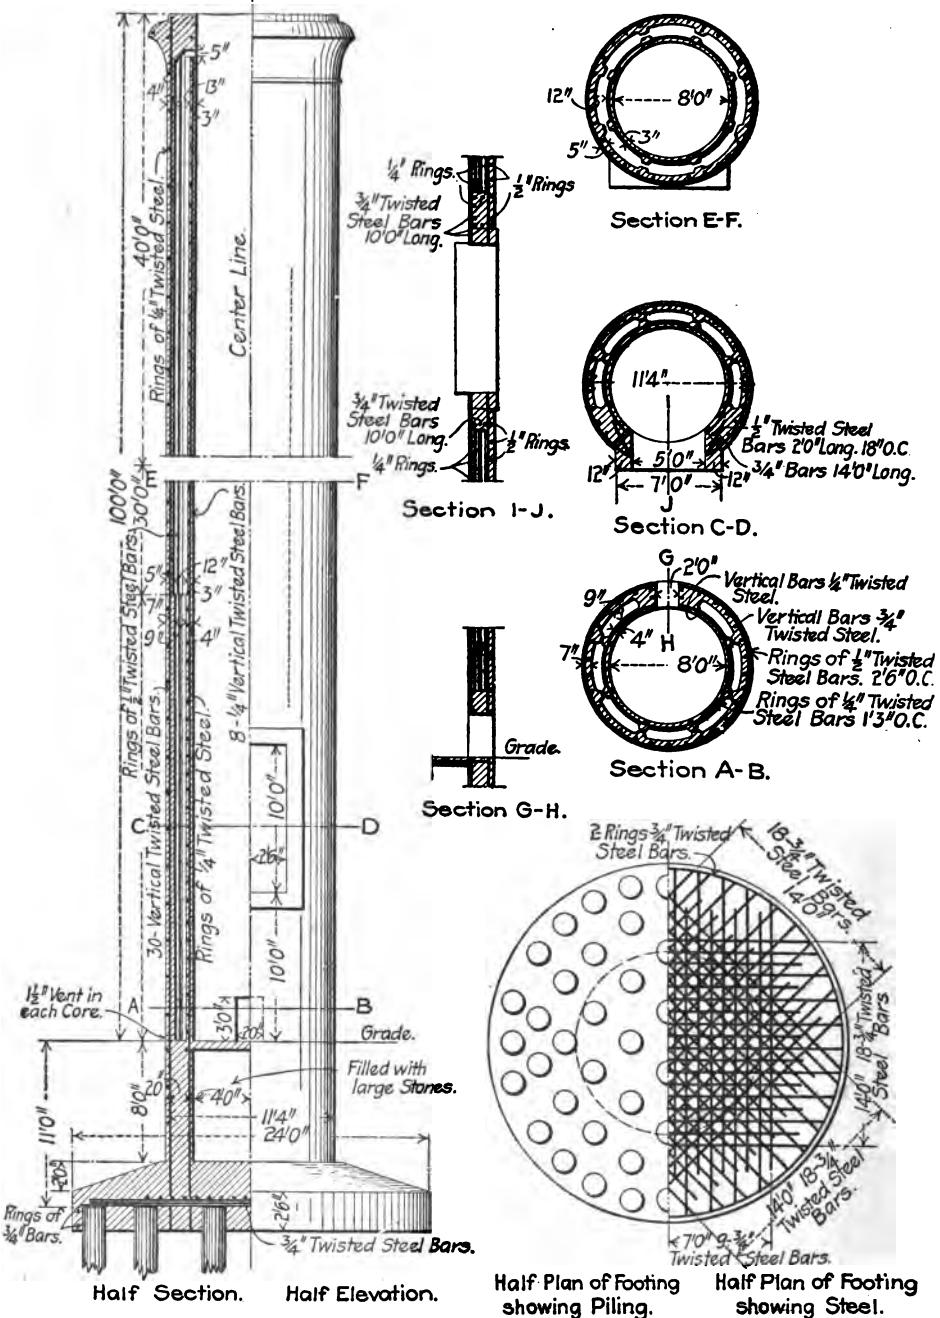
Ransome Concrete Steel Chimney, Central Lard Co., Hoboken, N. J.
